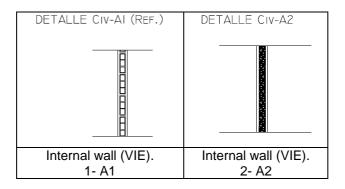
shows the typical section drawings of external wall (VEE) and figure 20 illustrates the internal wall (VIE) studied. The descriptions of the scenarios are based on real construction techniques taking into consideration the Spanish technical construction code. Annex 3 illustrates the architectonic drawing of the VEE studied and the engineering specifications.
